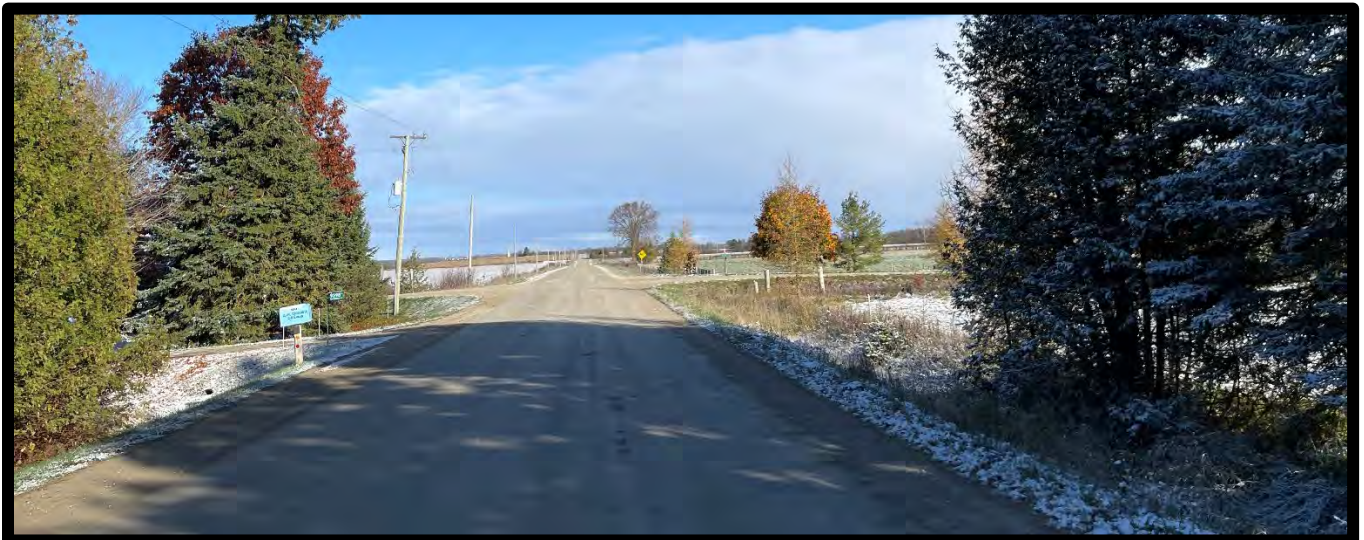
Concession Road 4 North at Highway 89 (November 1, 2023)
